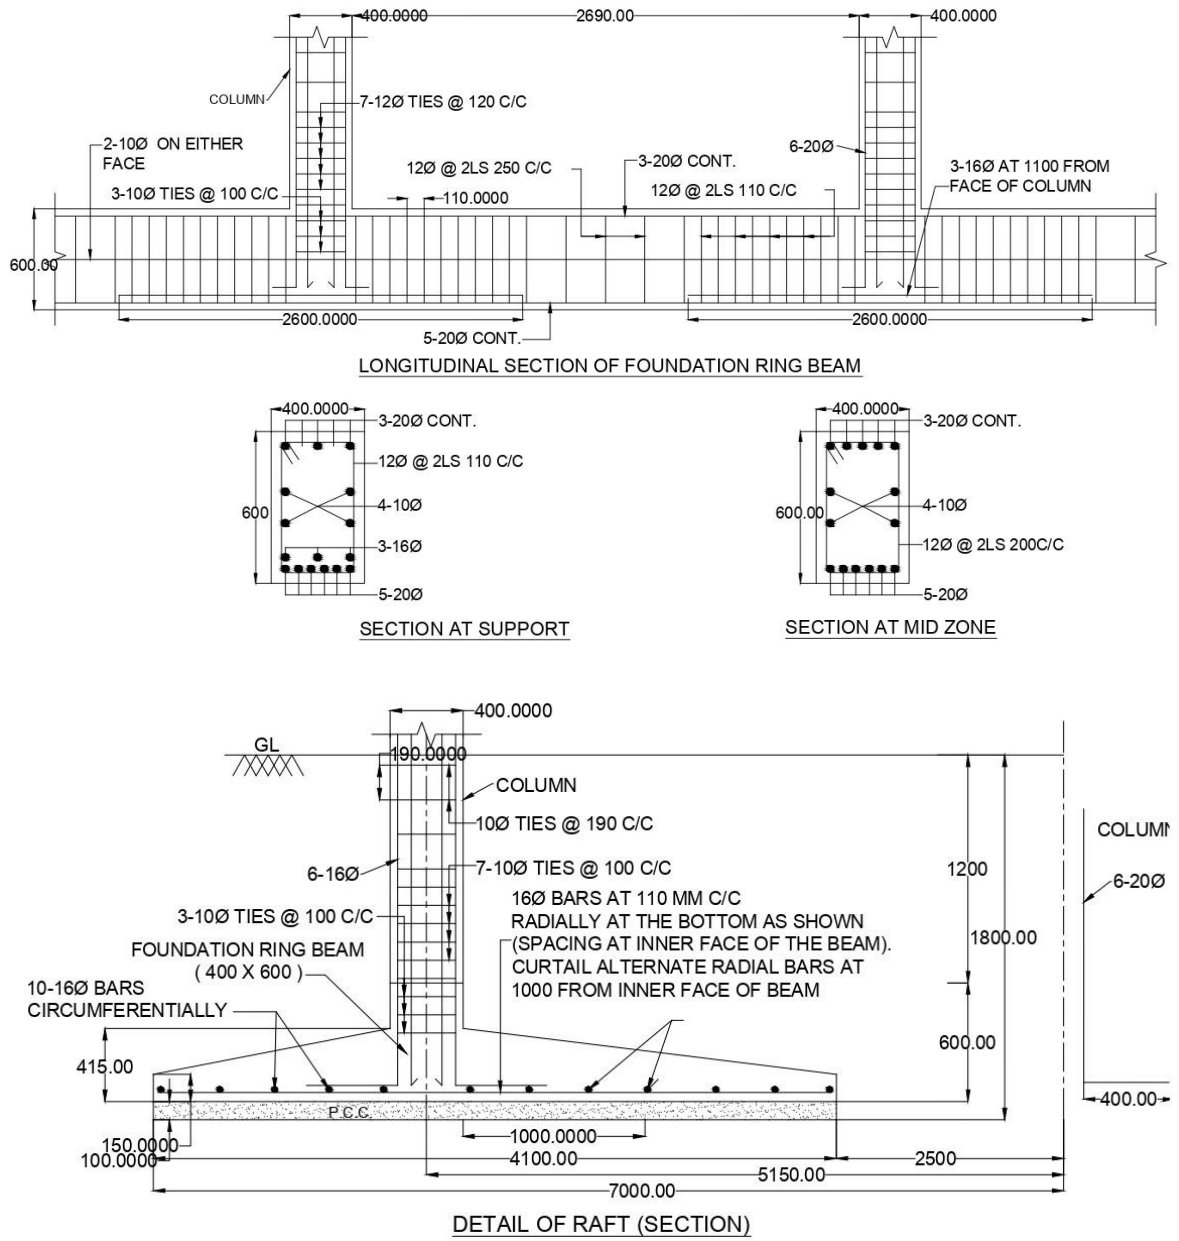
Reinforcement plan of foundation ring beam and raft foundation of hybrid Intze tank
